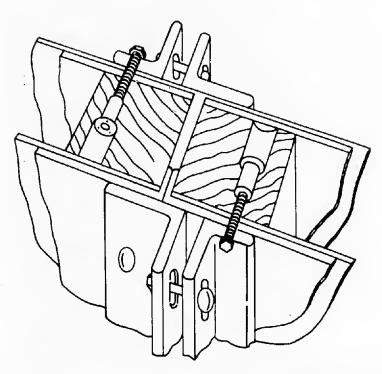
Typical panel-joining details for double electrically isolated enclosures.
